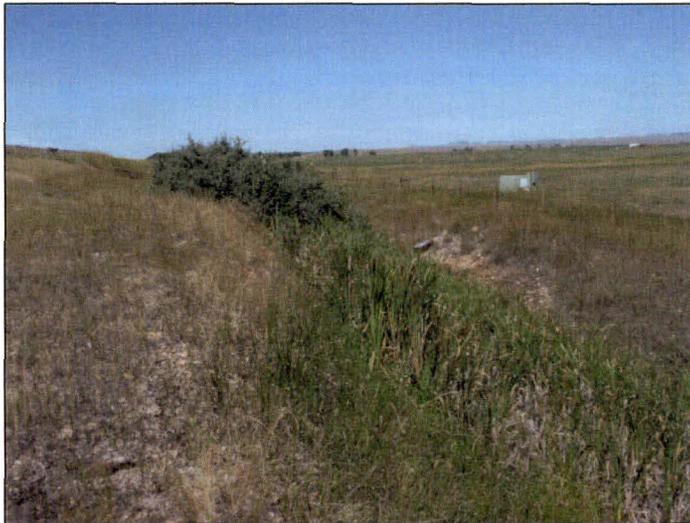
Site 3 - Sta. 1079+00, left. Northwesterly view up drainage along roadside toe of slope.
